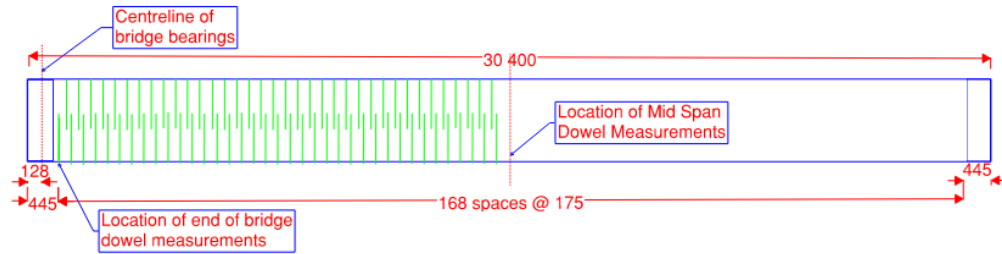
Girder Plan View Schematic Location of Dowel Measurements and Results
